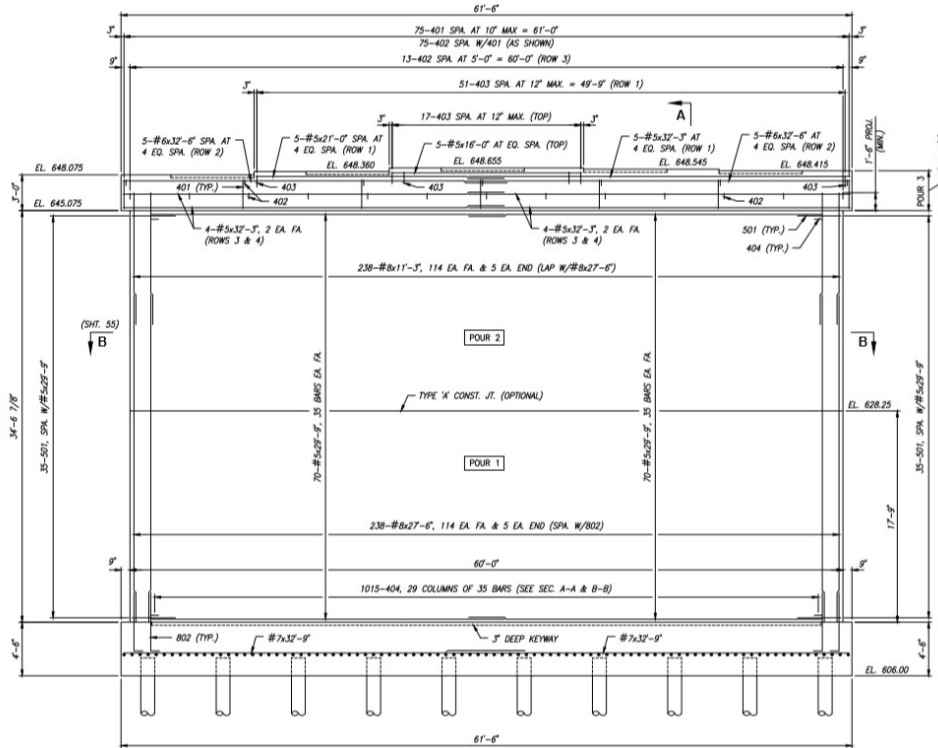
Transverse Elevation of an Interior Pier of Bridge (NBI 5941) (2014)
